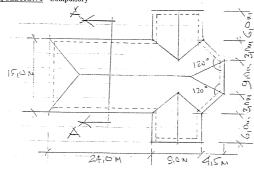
Roof Plan (Not to scale). – illustrates the roof plan of a Church Building. Assuming the cladding material is corrugated aluminium sheets:
